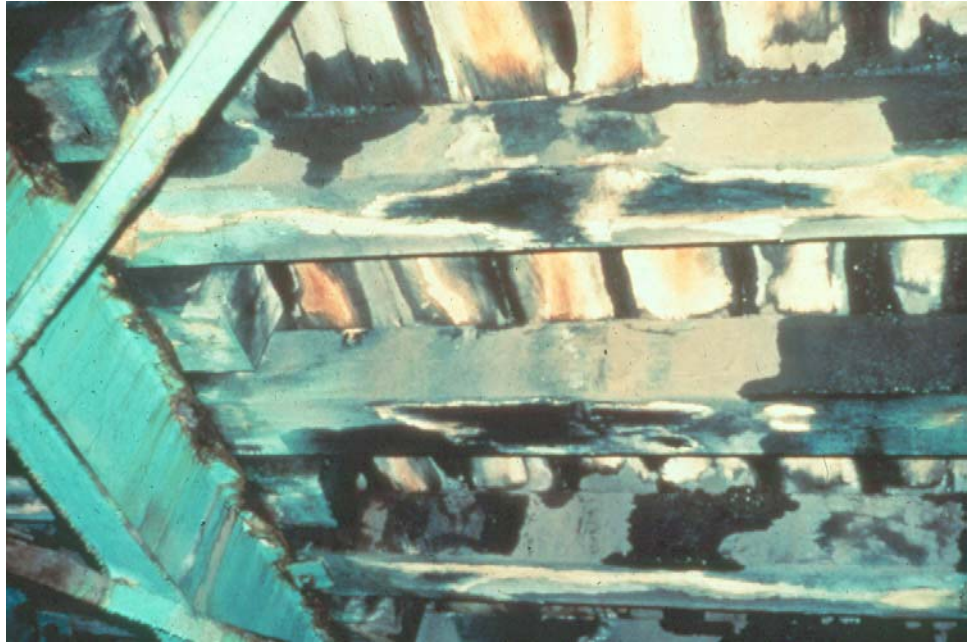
Mold and Stain on Underside of Timber Bridge
